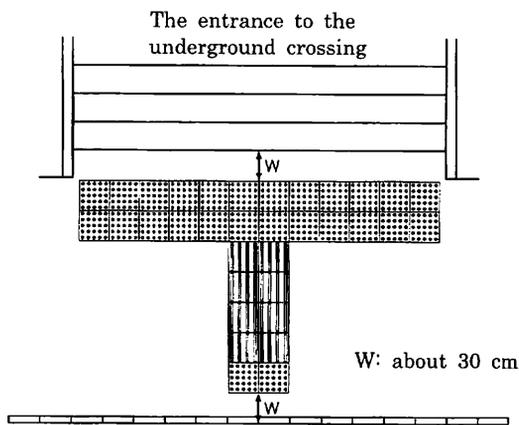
Example of installation (2) at the exit and entrance of the underground crossing (The situation where the direction of the entrance to underground passage is at right angles to the direction of travel of the footway)
